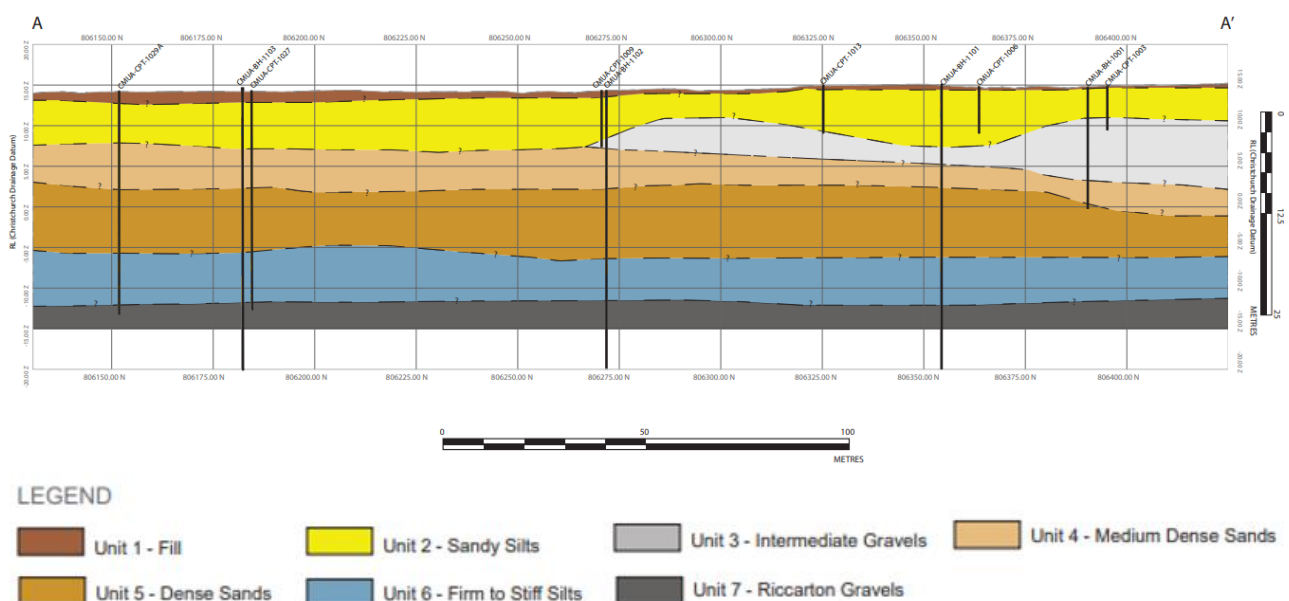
Geological long section through the Te Kaha site (north on right hand side of section).
